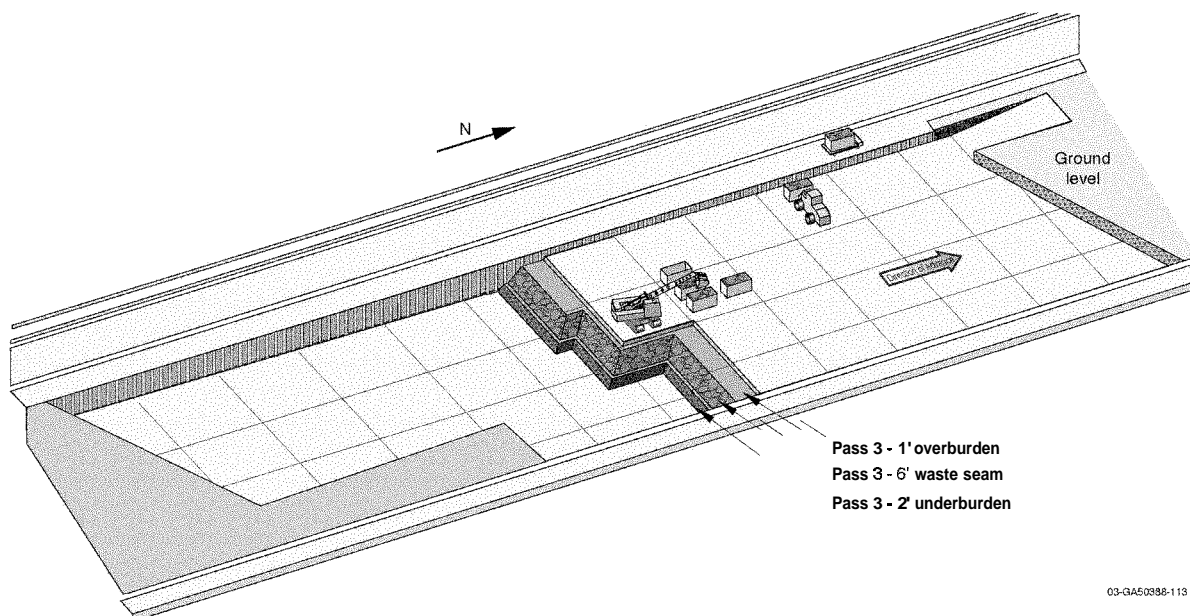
The backhoe and forklift/loader excavate the waste seam and underburden from the pit moving south-to-north.
